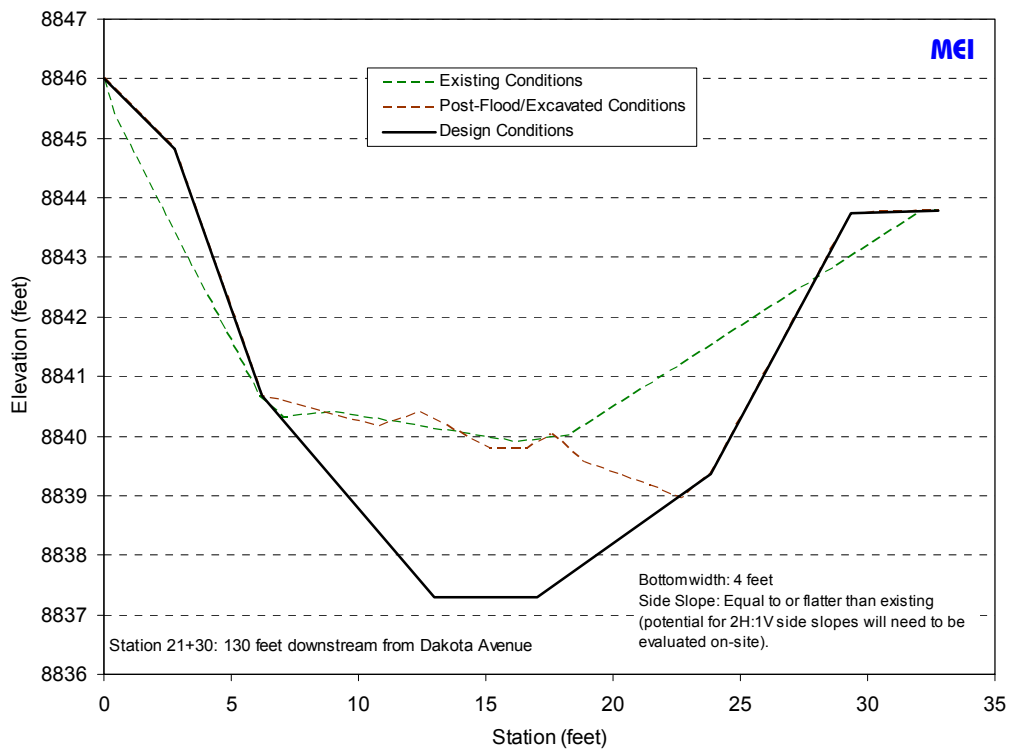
Cross-sectional schematic showing existing and post-flood/excavated conditions channel and channel design template at Sta 21+30.
